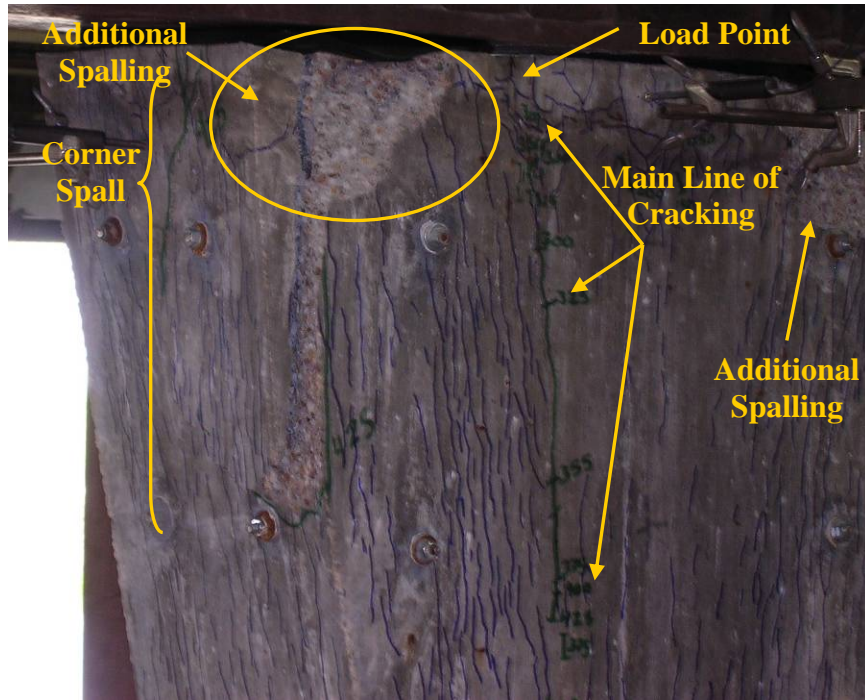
Additional Spalling on Column A<sup>111</sup>
